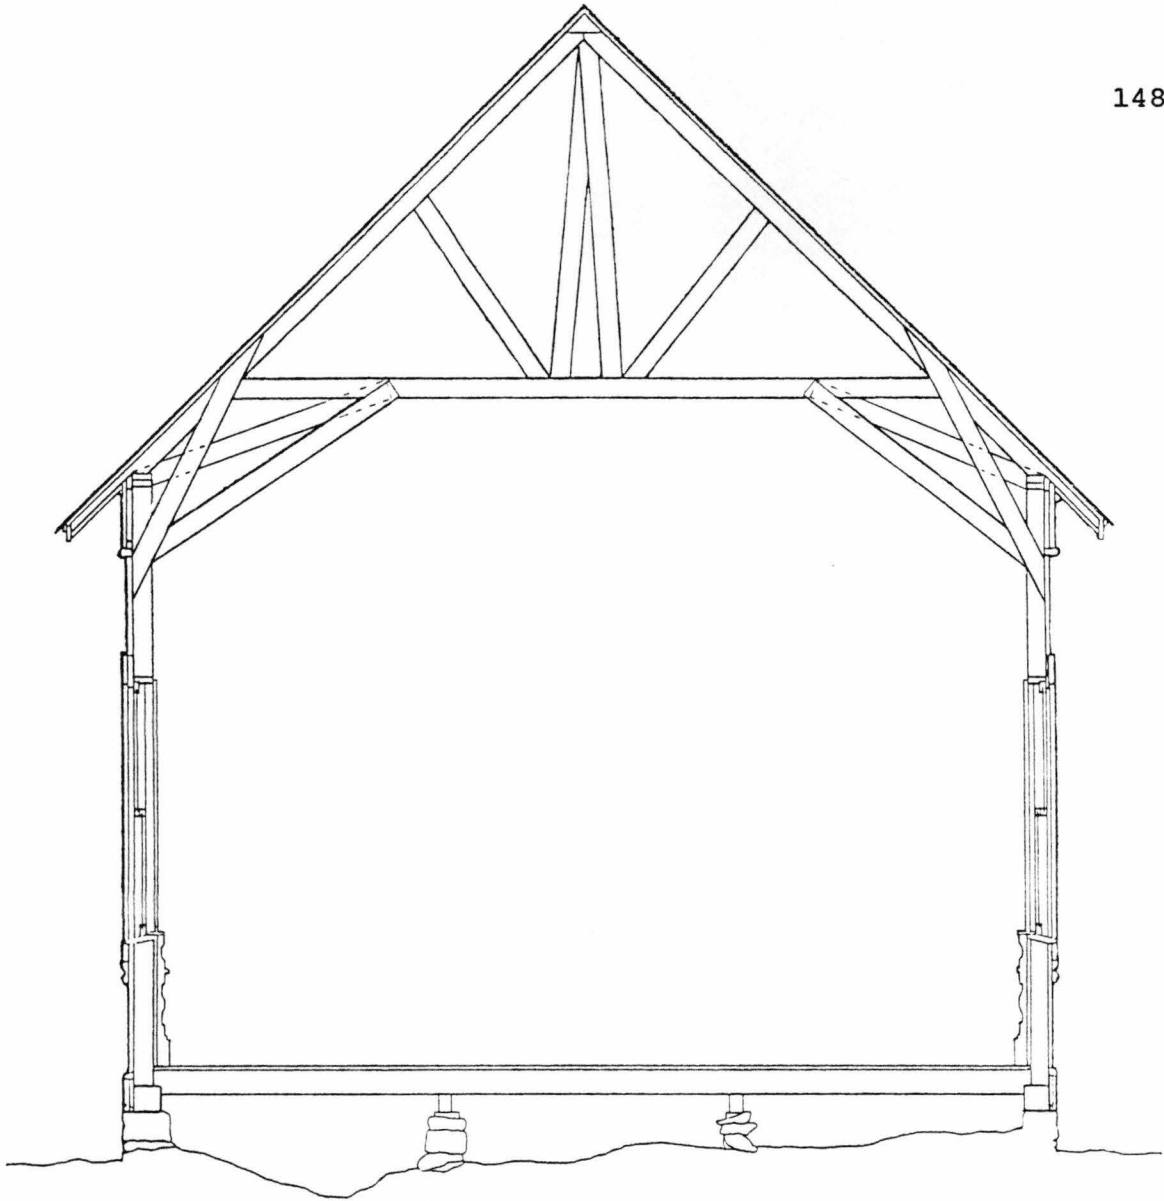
Sketch of roof structure reinforcement scheme.
